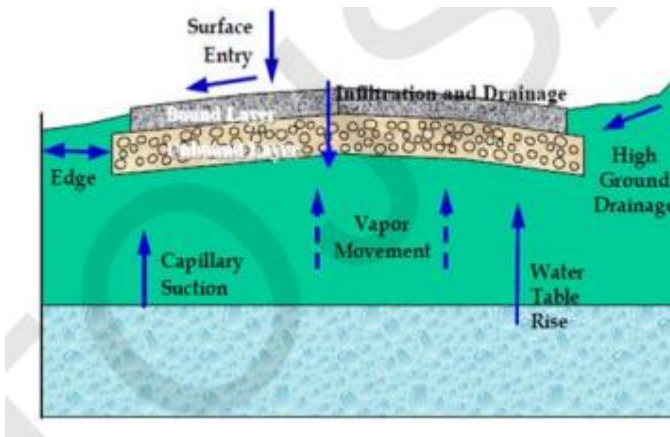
Feasible Water Fountainhead in Pavement [11 andElsayed, 1996)
